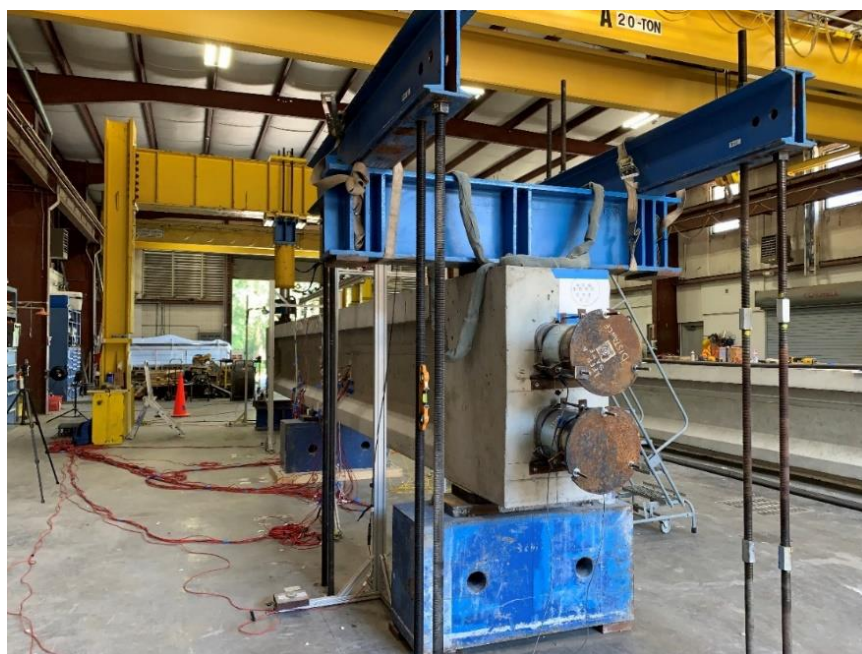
Beam specimen NB-3 inside test frame and tie-down
